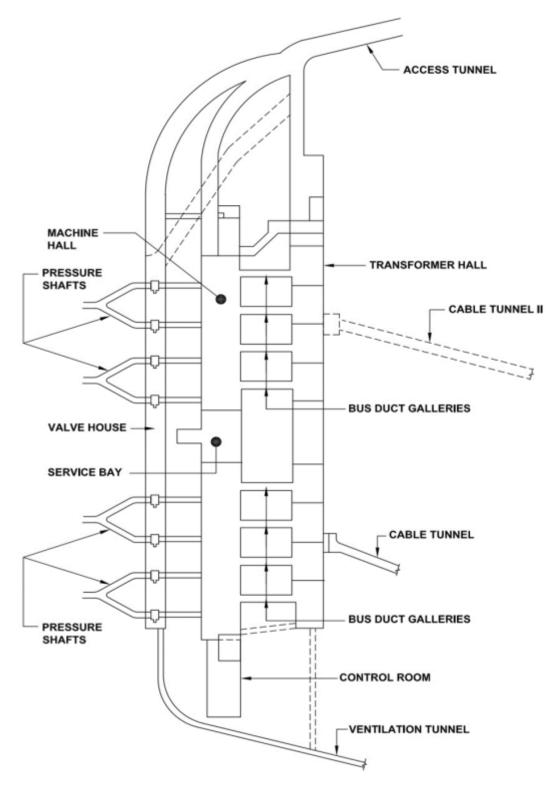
B LAYOUT OF PARALLEL HALL ARRANGEMENT IN POWER STATION
